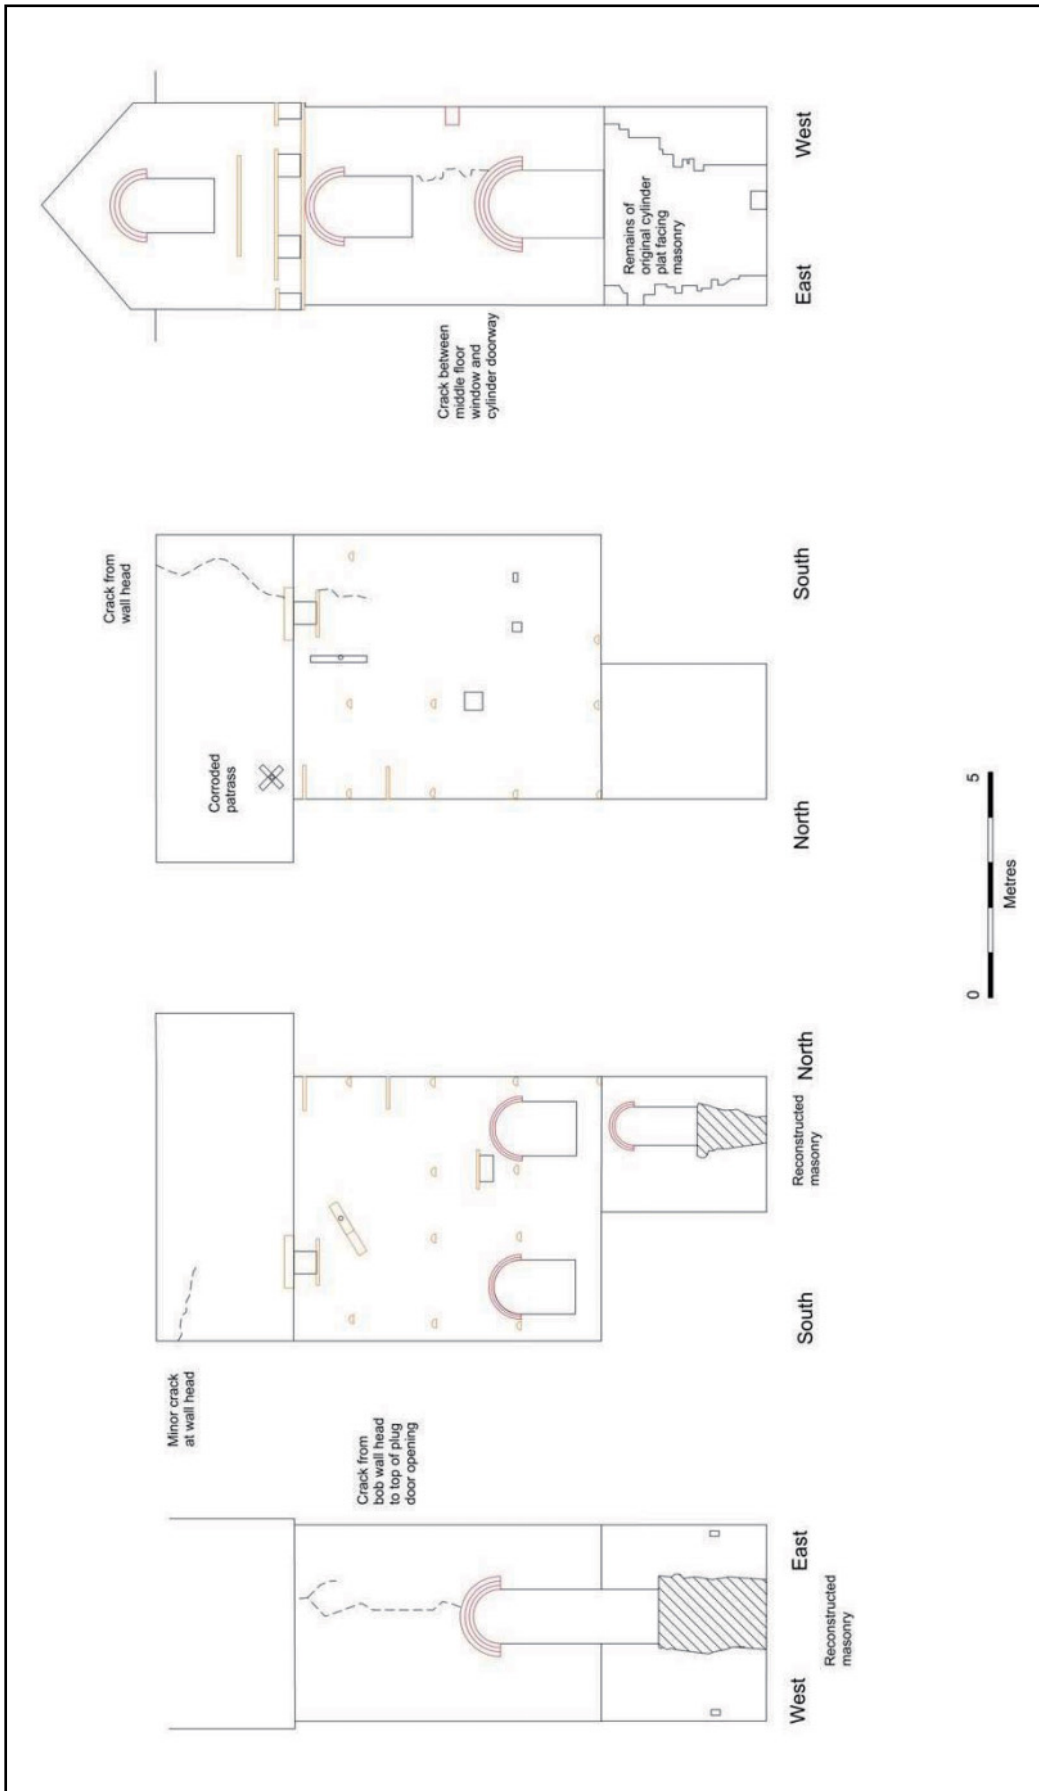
Internal elevations of Towanroath pumping engine house [190390].
